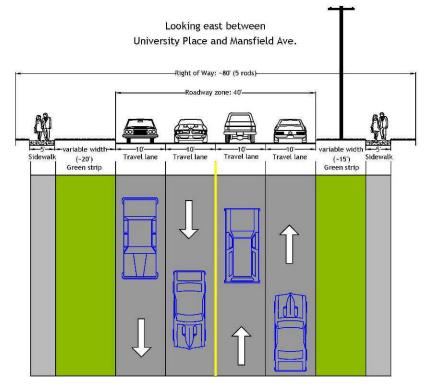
Typical roadway cross section between University Place and Mansfield Ave
